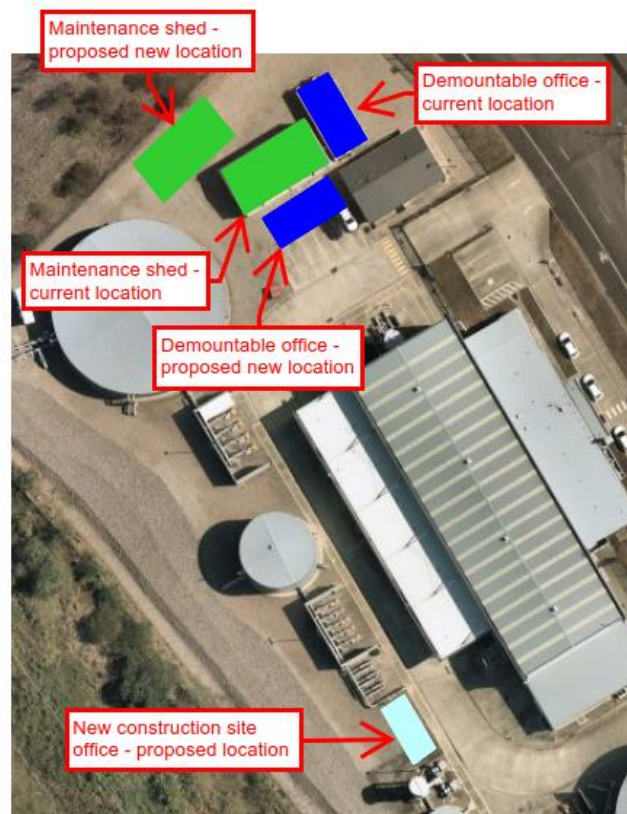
Proposed location for maintenance shed, demountable office and construction site office
